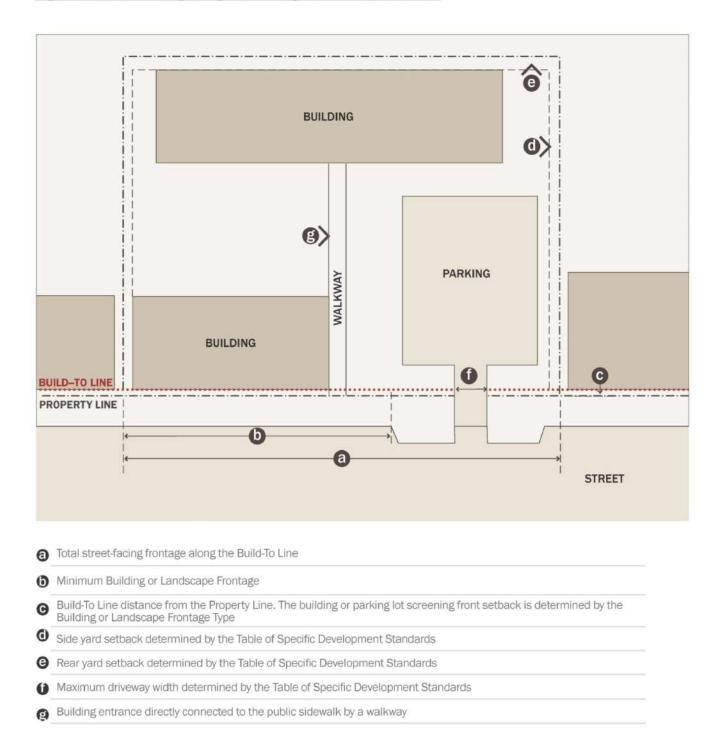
Building Siting for Buildings at the Rear of a Lot
